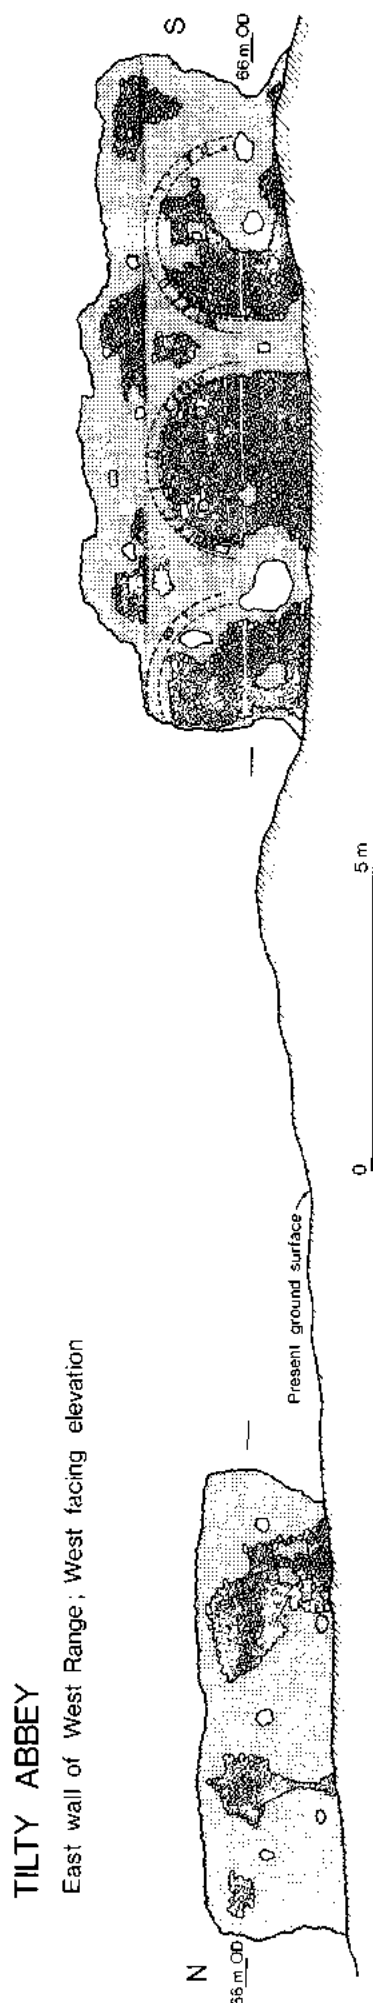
Tilty Abbey. General elevation of the east wall of the west range; north and south sections.
